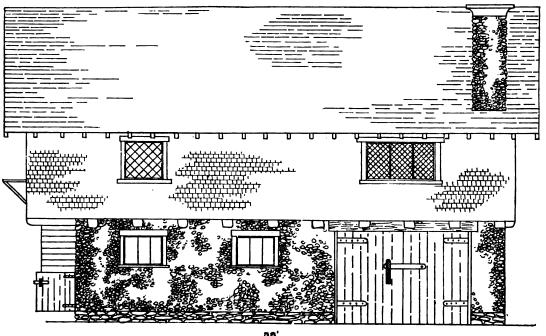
, 184, 185 and 186 show a plan containing one box-stall, two single stalls and room
